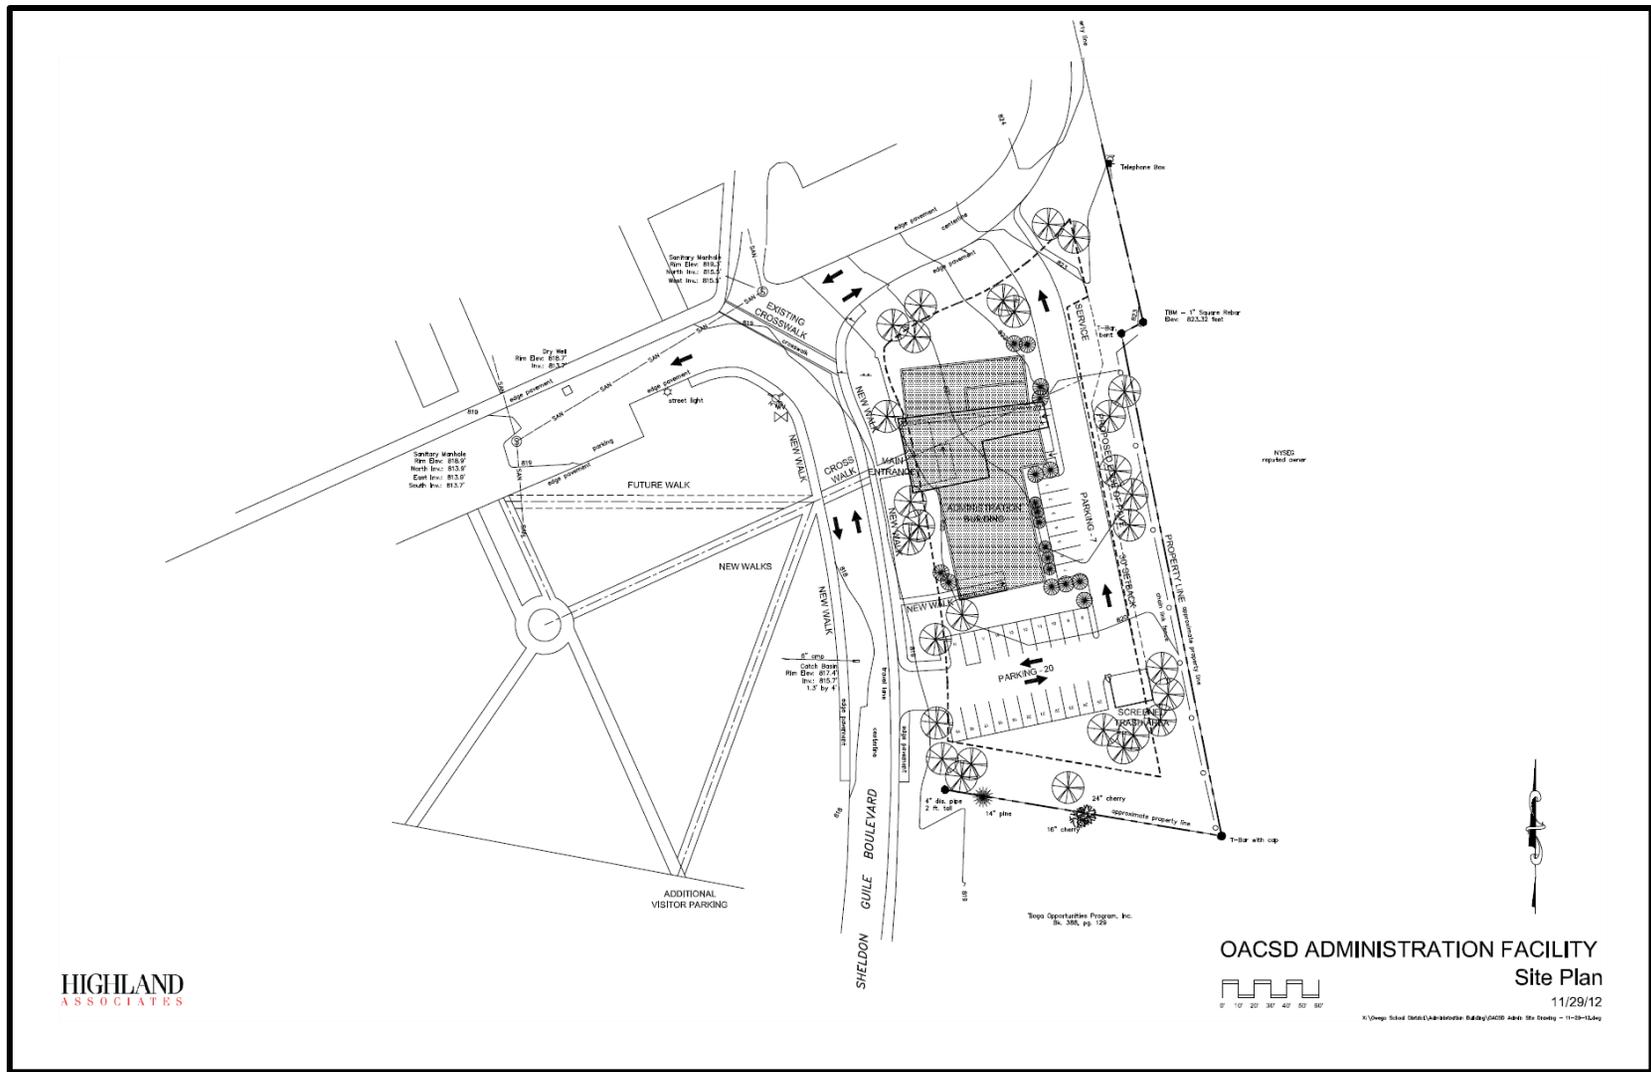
Proposed site plan for New Administration Building Facilities. Source: Environmental Assessment.
